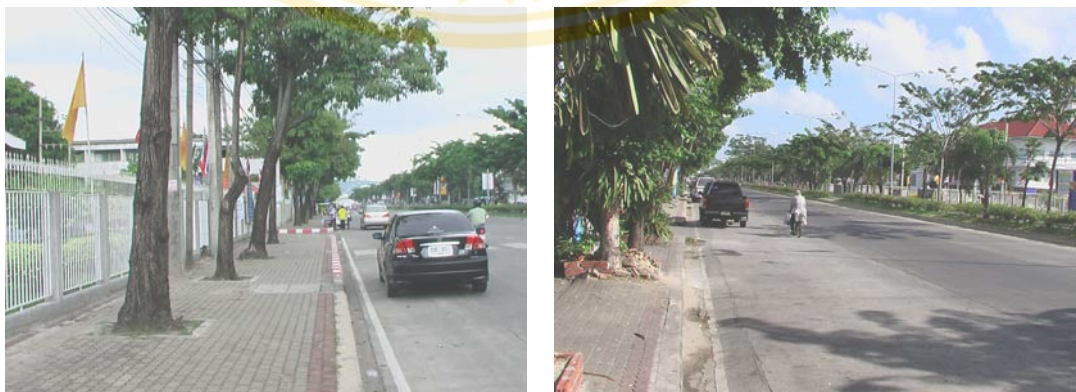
Road conditions and sidewalks at Ramwithi Road.
